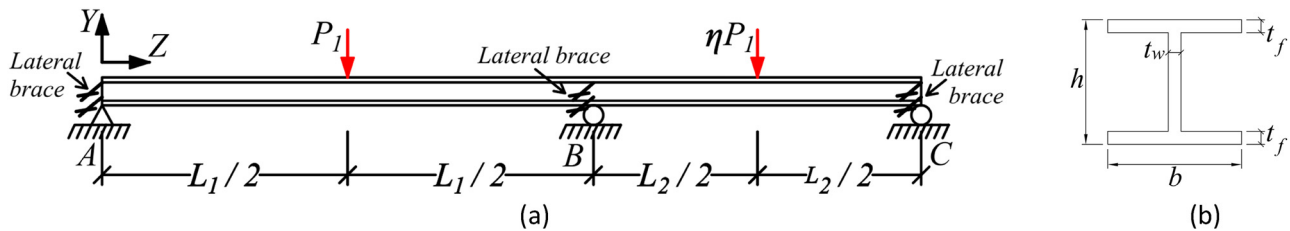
Profile (a) and cross-section (b) of the two-span continuous steel beam in Example 3.
